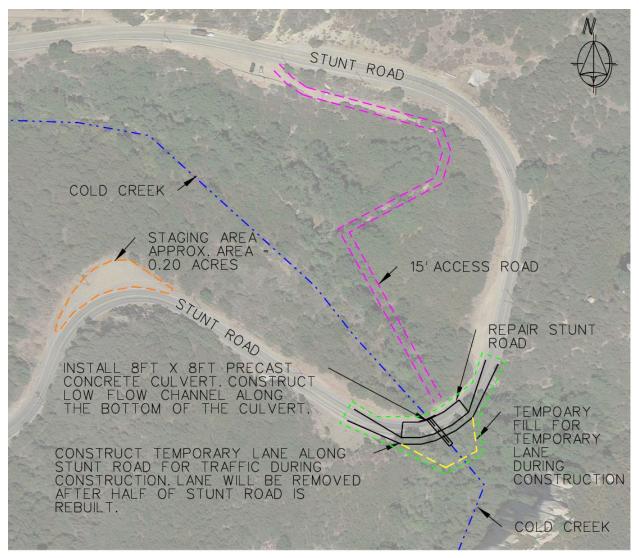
CC8, Stunt Road Crossing Schematic Design Part B
